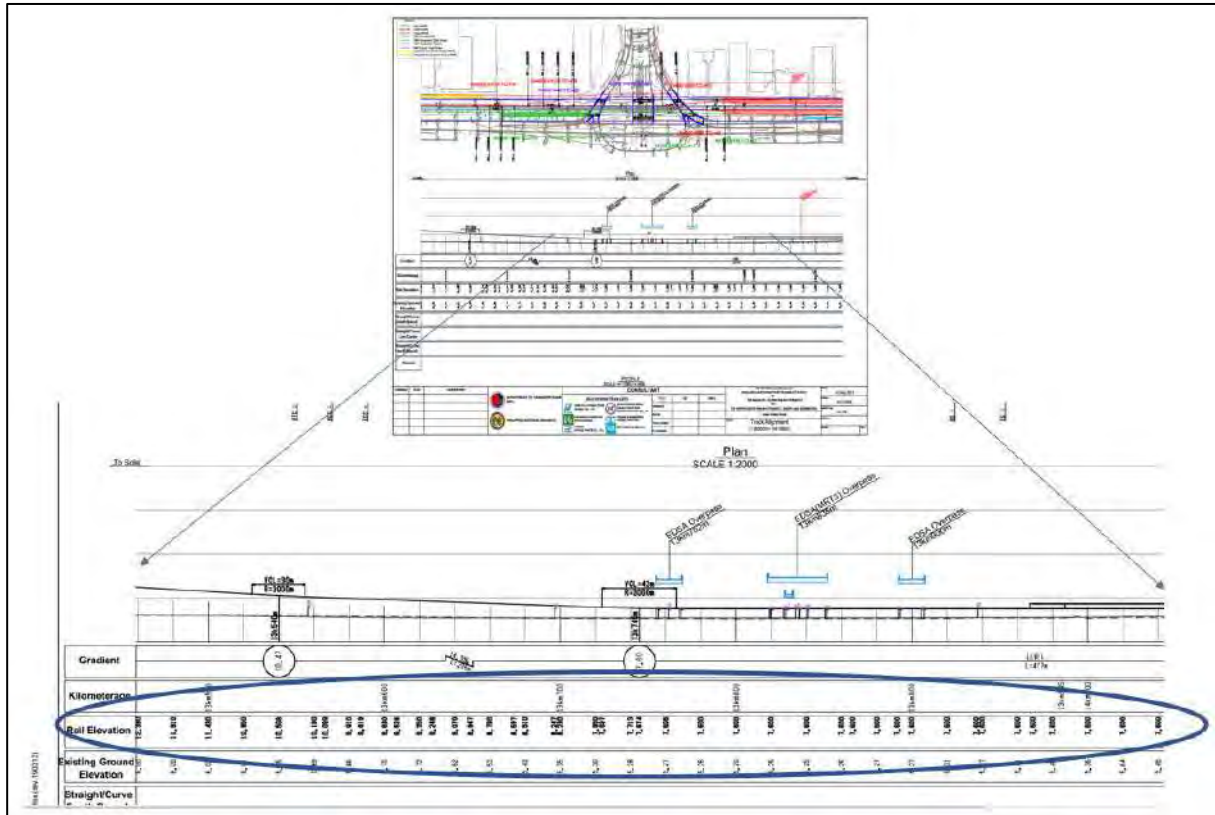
Rail elevation data taken from the detailed engineering design
